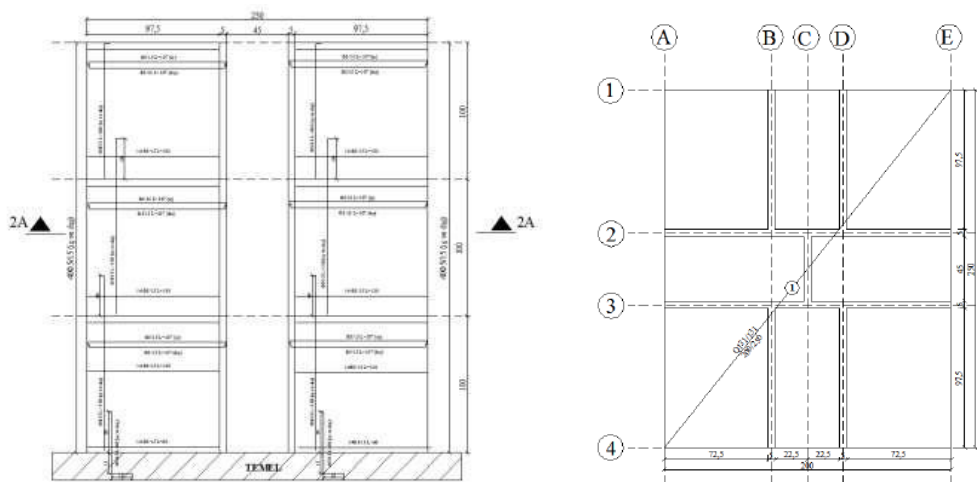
Tunnel form building shear wall and floor mesh reinforcement.
